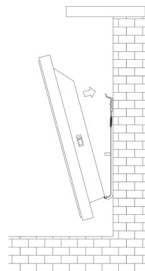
Attaching upper hook of the wall mounting brackets to the convector
